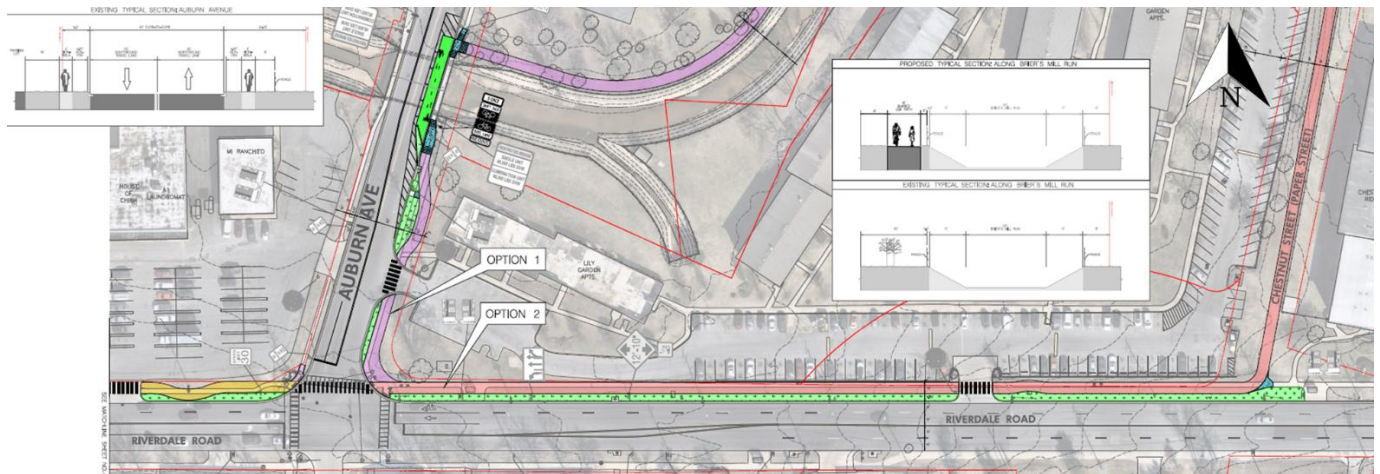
Proposed facility options from the intersection of Auburn Ave at Riverdale Road, heading toward Wildercroft local park
